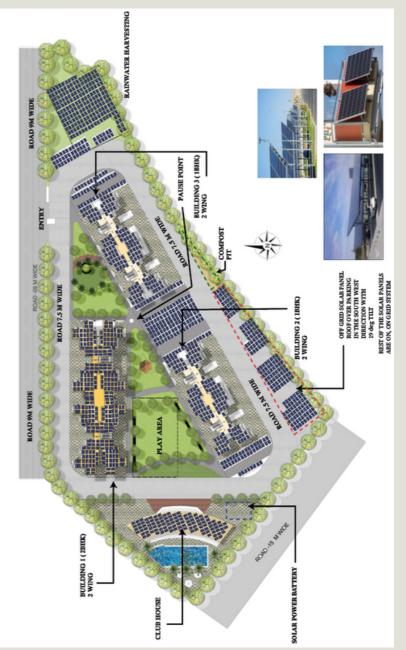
SITE PLAN SHOWING SOLAR ROOF, RAINWATER HARVESTING AND COMPOST PIT
